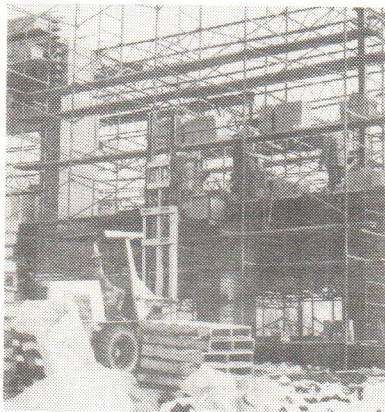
The scaffolding outlines the new building while providing masons with a platform upon which to work.
